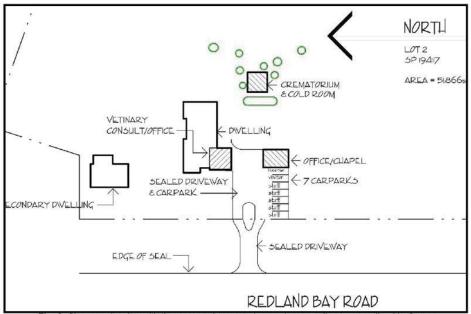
Shows a site plan with the proposed crematorium and surrounding trees outlined in Green.
